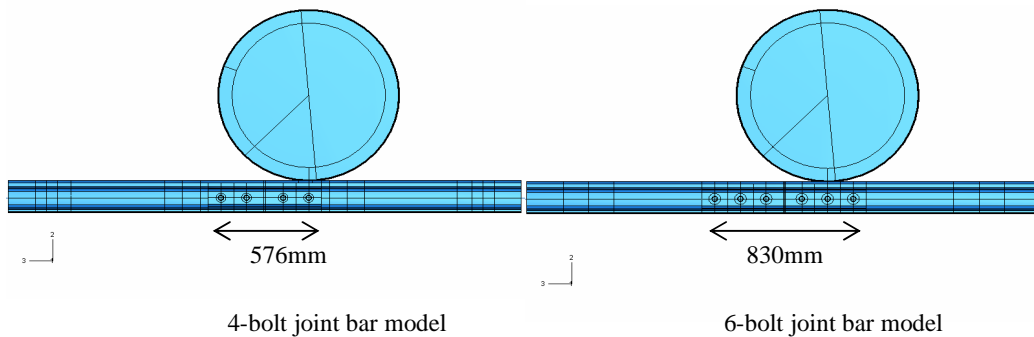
4-bolt and 6-bolt joint bar IRJ model
